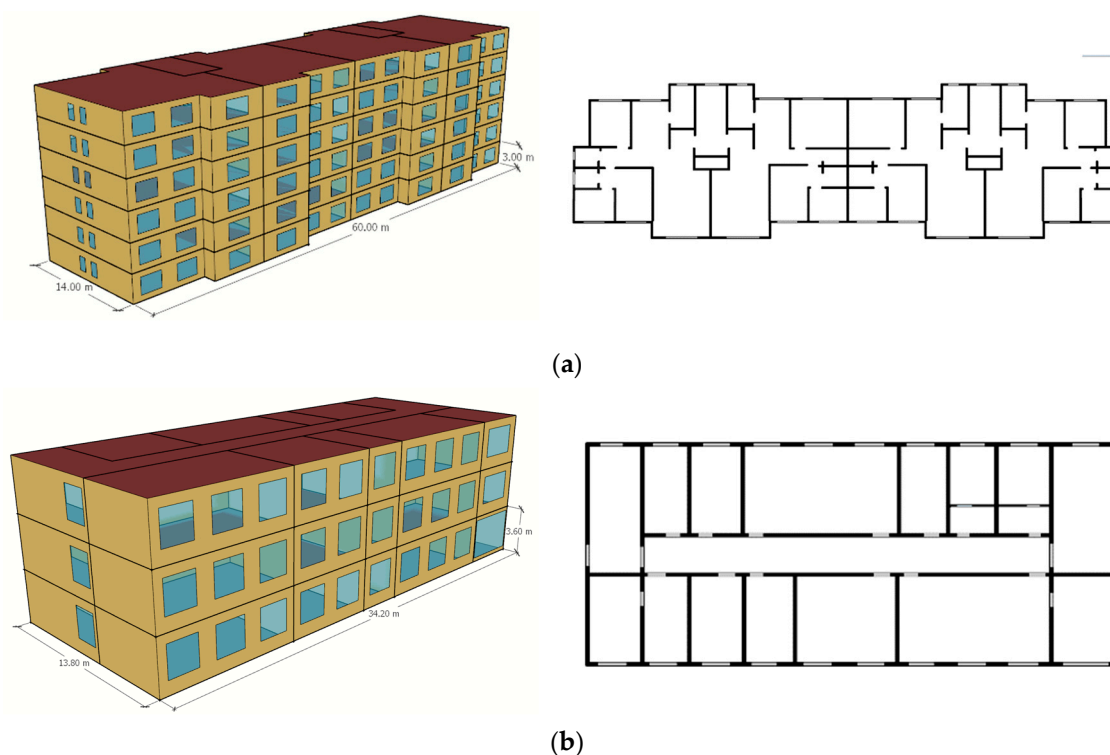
Simulated buildings models and typical floor plans (a) residential building; (b) office building.
